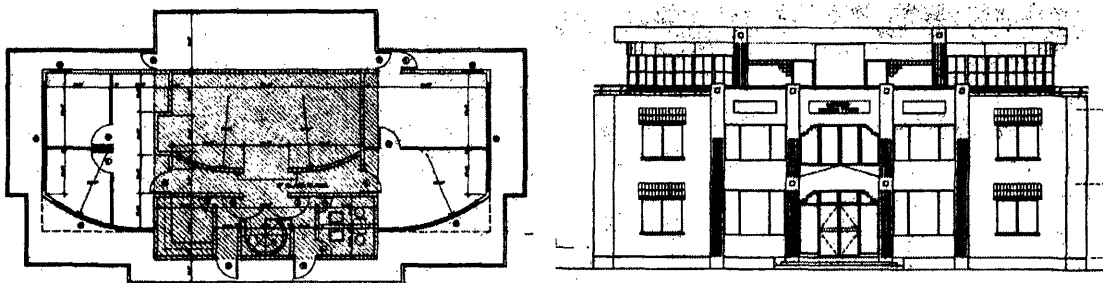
Plan and elevation of the rooftop addition, as per the project by Luis Gutiérrez, AIA.
